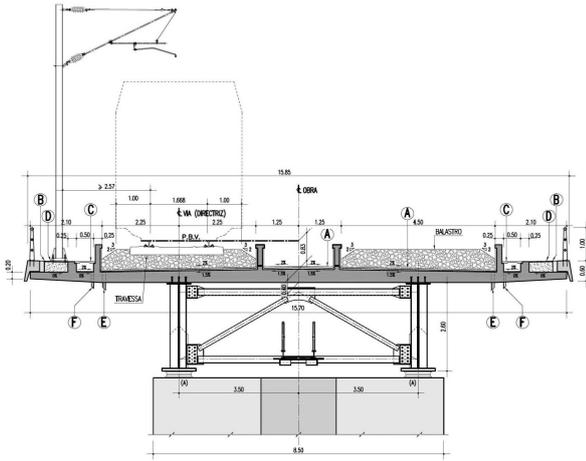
Case study #1: cross-section over piers – alternative A [5]
